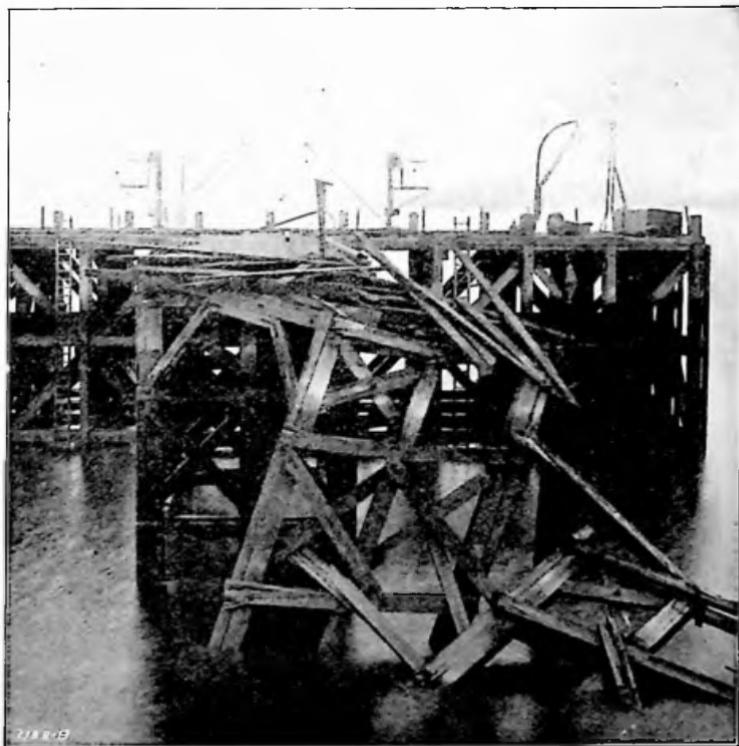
Timber Quay, damaged by 11,000 ton Steamer.
